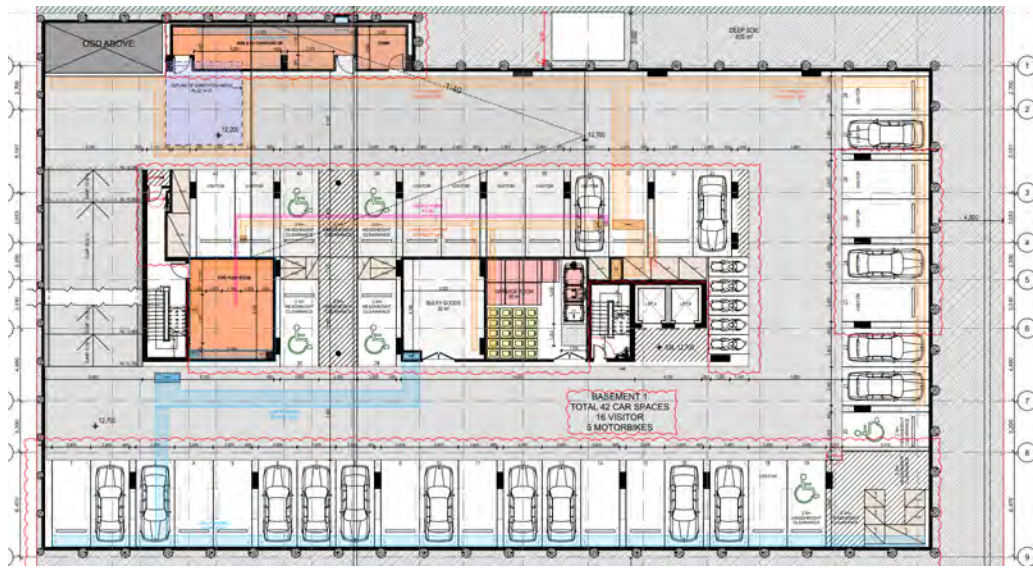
Proposed basement 01 plan showing 42 parking spaces.
